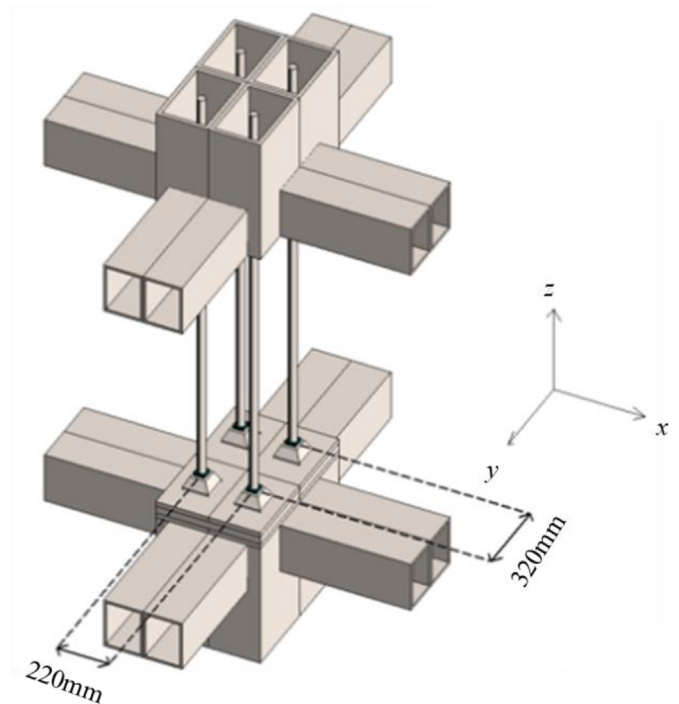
Exploded 3D view of an internal inter-module joint connecting eight modules (4 top and 4 bottom).
